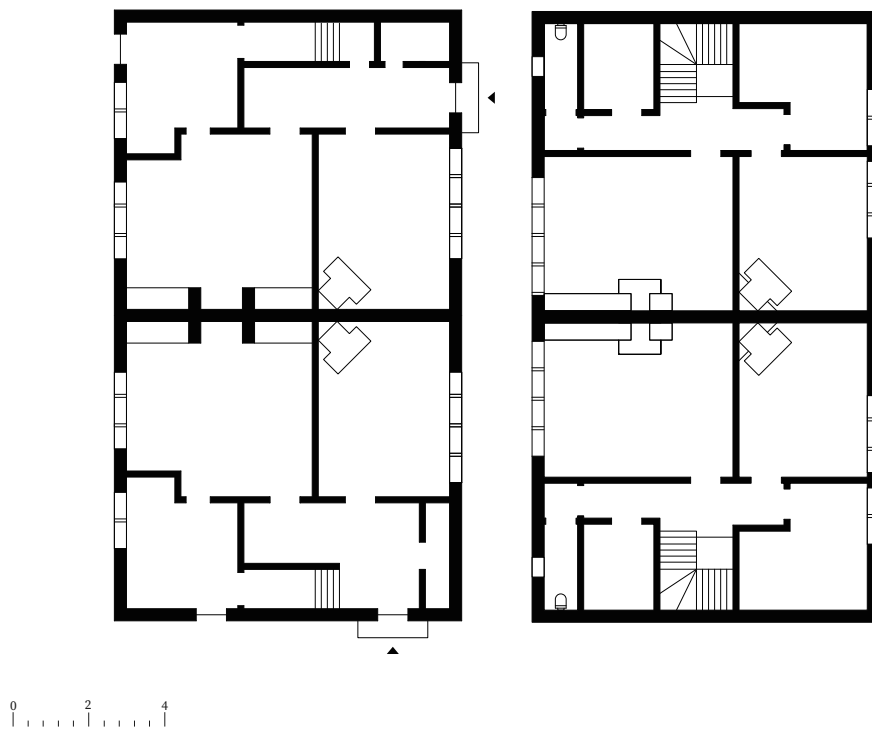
Plan, house in Letchworth Garden City, Letchworth - 1:200
